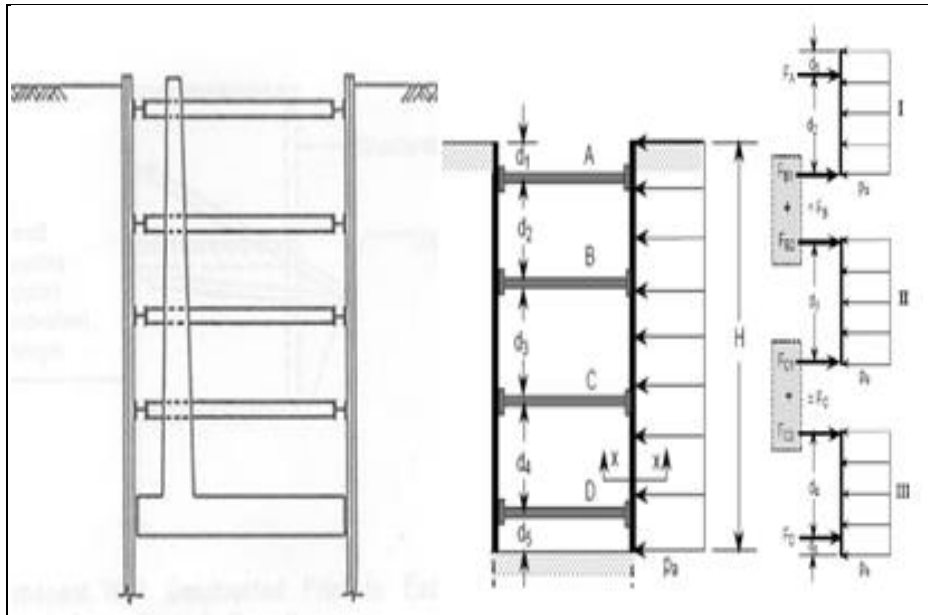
Use of a foundation alone to support the retaining wall in a narrow staged cutting and four level temporary bracing [2]
